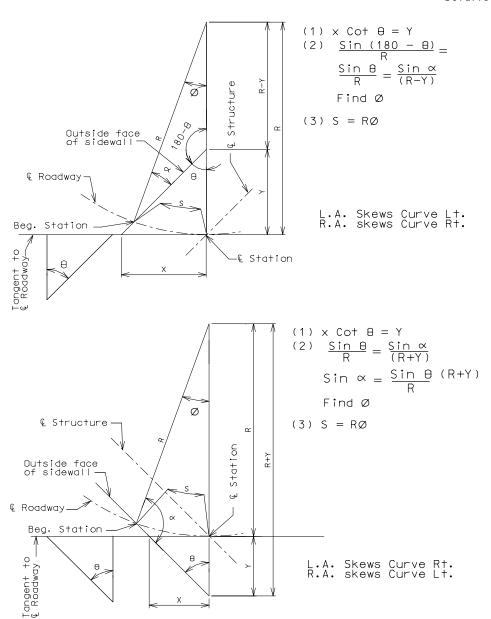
Details and Sample Calculation of Beginning Station
